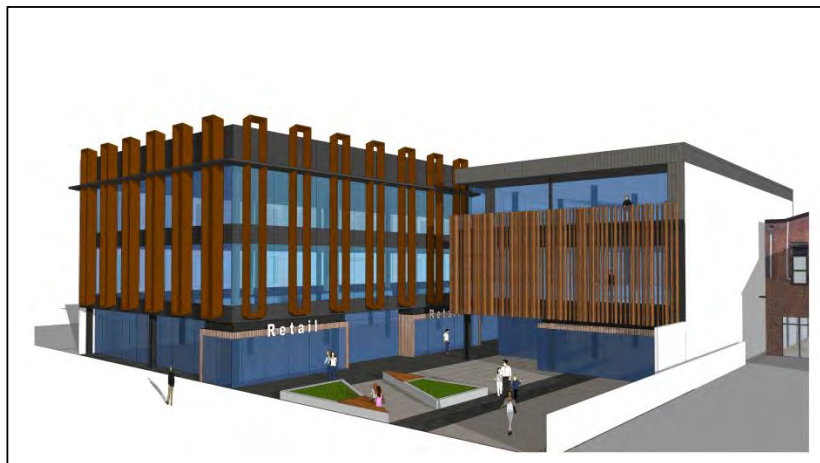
Concept plan of the development, looking south-east from Spey Street.
